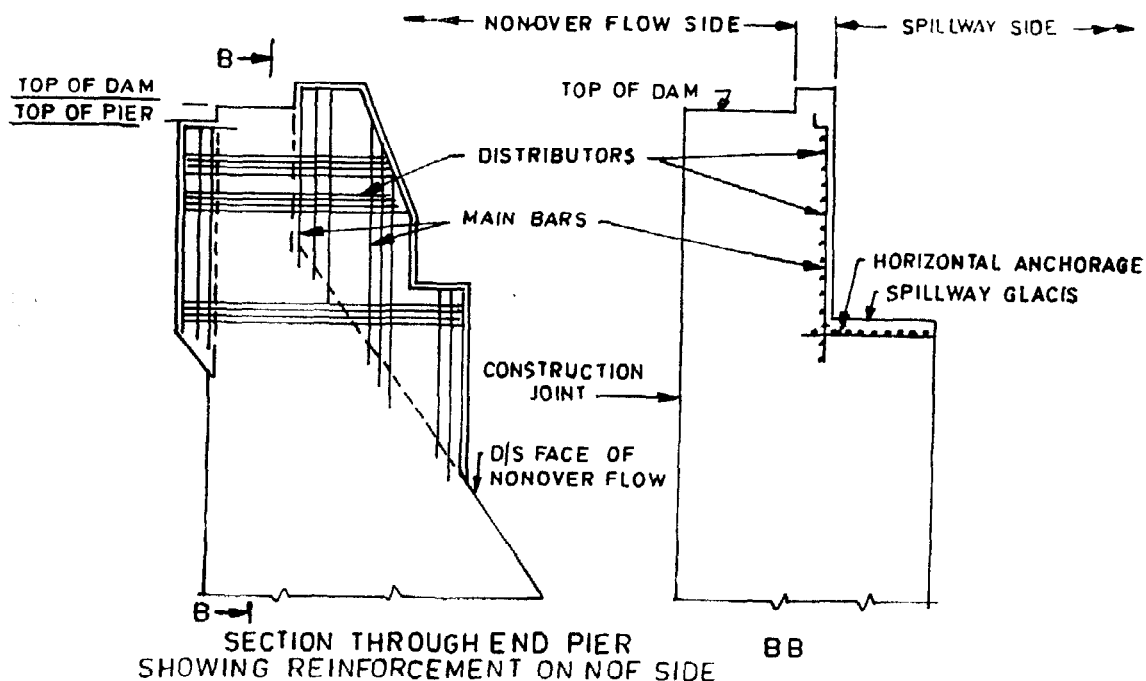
TYPICAL REINFORCEMENT DETAILS FOR END PIERS TOWARDS NON-OVERFLOW SIDE
